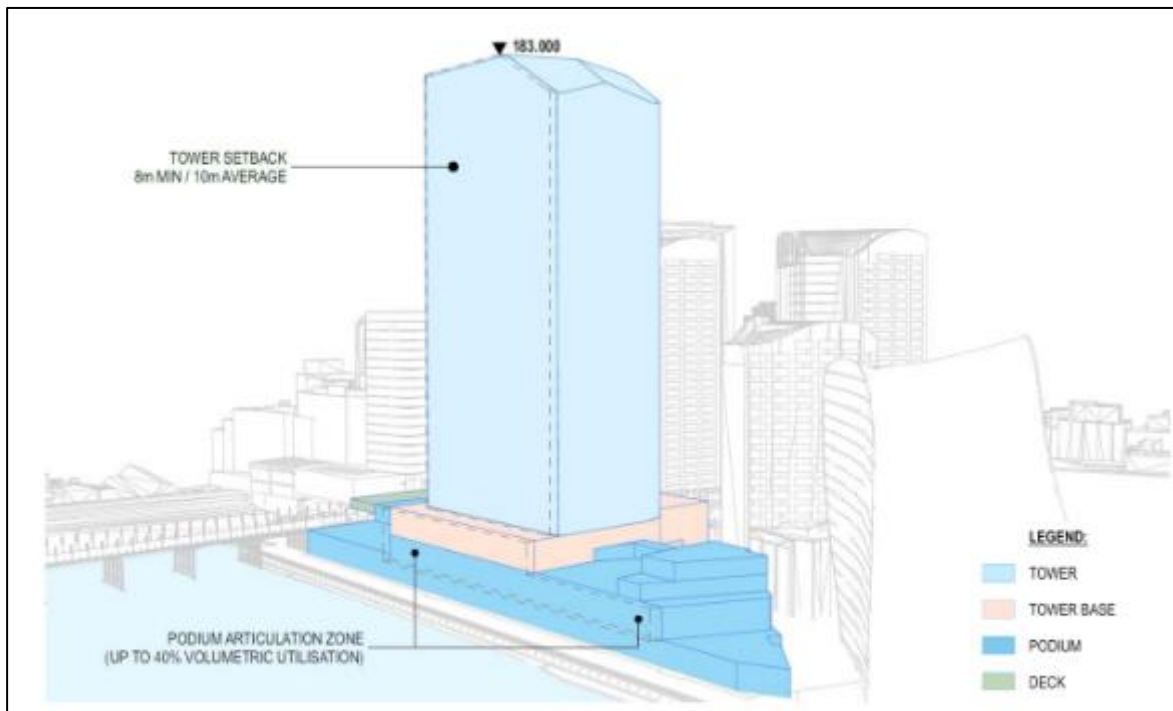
Stage 1 Concept Proposal - approved building envelope (Ethos Urban 2020)
